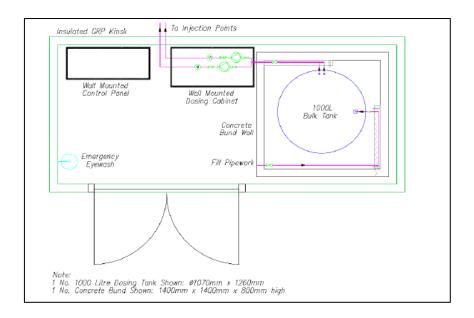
UÉ schematic of a bulk tank kiosk layout in H₃PO₄ Installation with 500 litres< bulk storage ≤ 6,000 litres.
